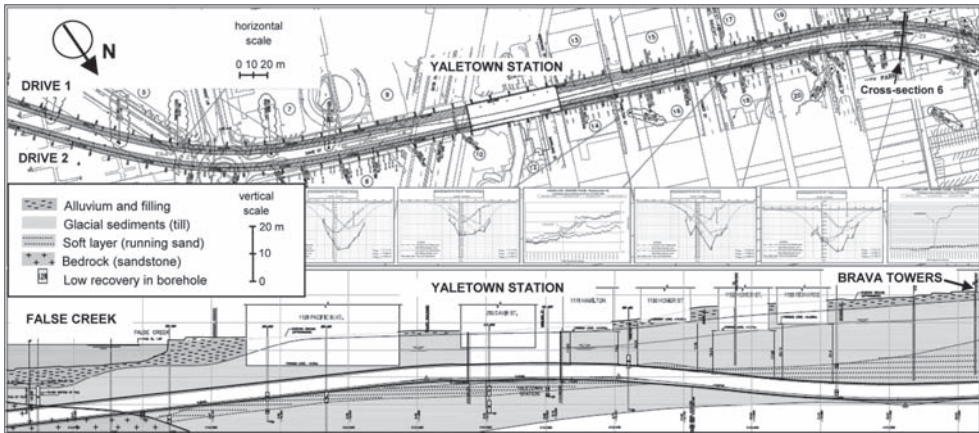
Plan of Canada Line from False Creek to Brava Towers and geological profile along tunnel alignment (ratio of vertical to horizontal scale, 1:2).
